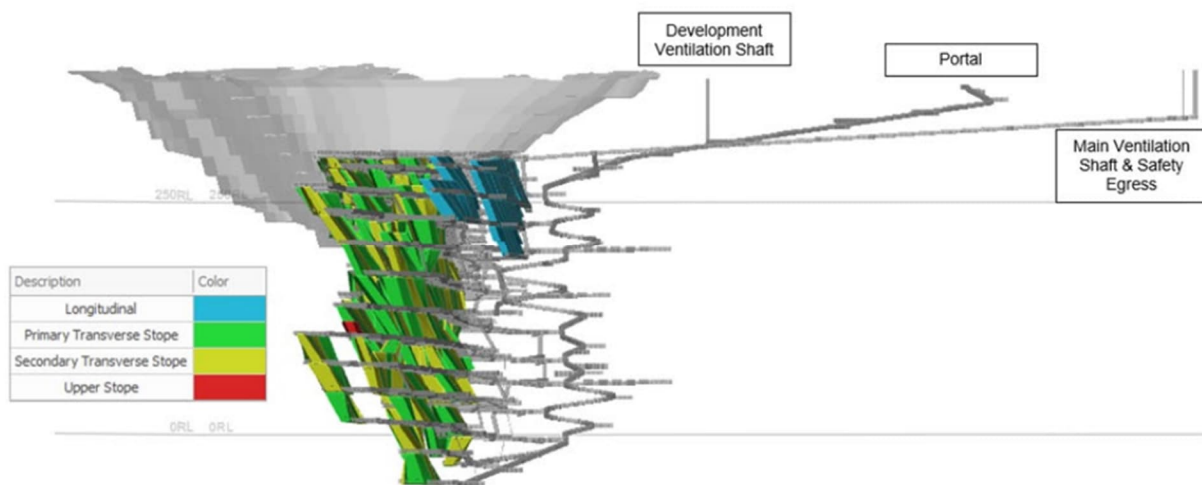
Cross-sections of underground workings – view oriented 289°W (GMS, 2025)
